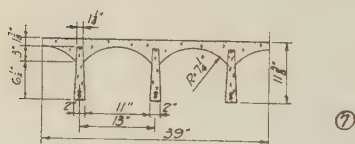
(LEFT) ISTE G CONCRETE FLOOR
